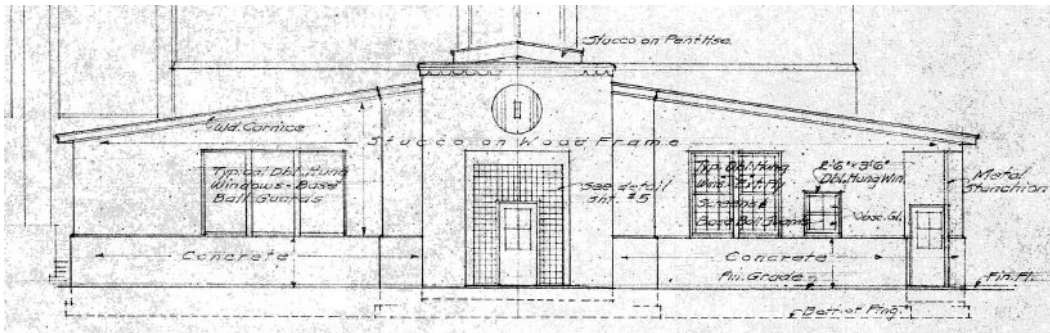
North façade of Cafeteria building as designed in 1949. Source: OUSD.
